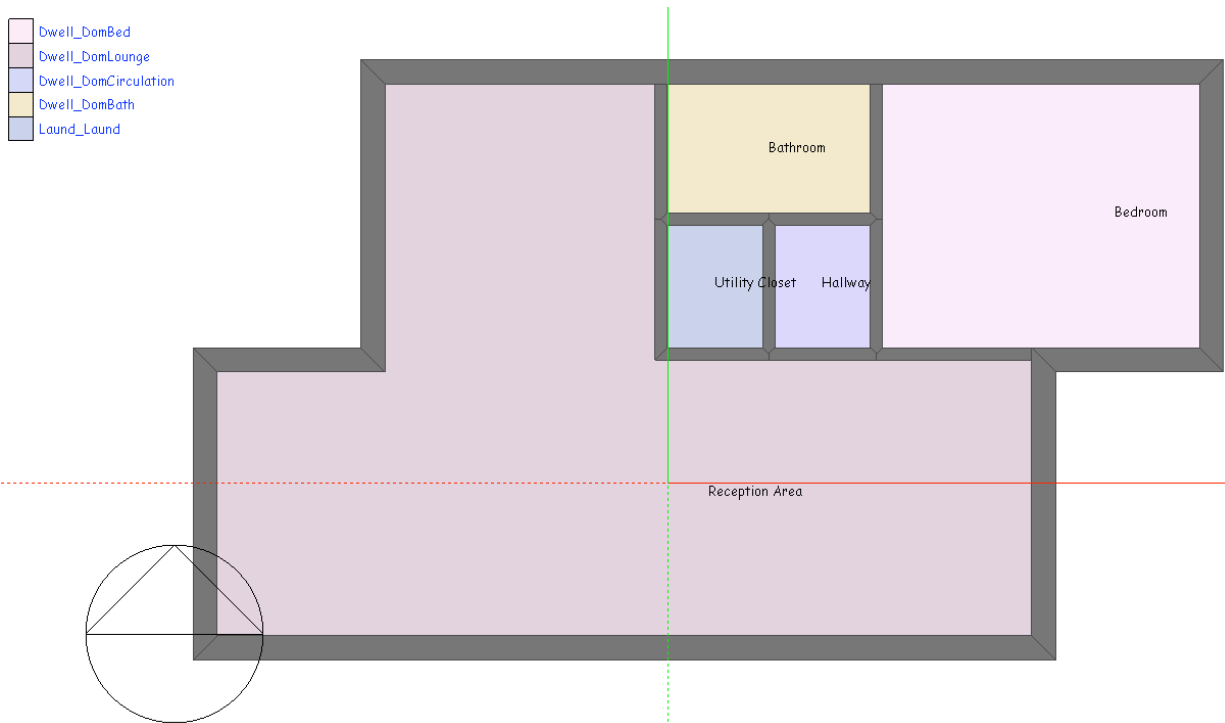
Zoned Floor Plan From Design Builder Energy Modeler
